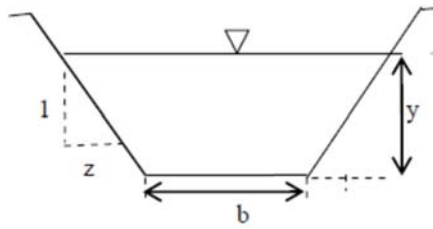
Horizontal Cross-section Trapezoid Channel [2].
